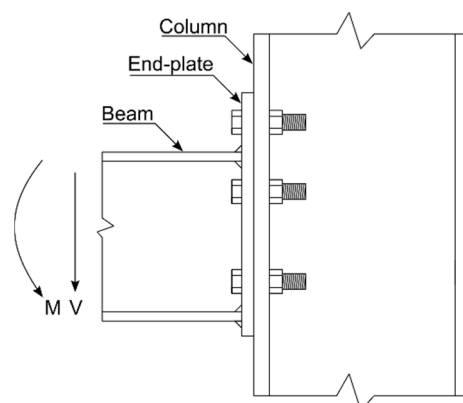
Elevation view of a typical beam-to-column joint with end-plate connection.
